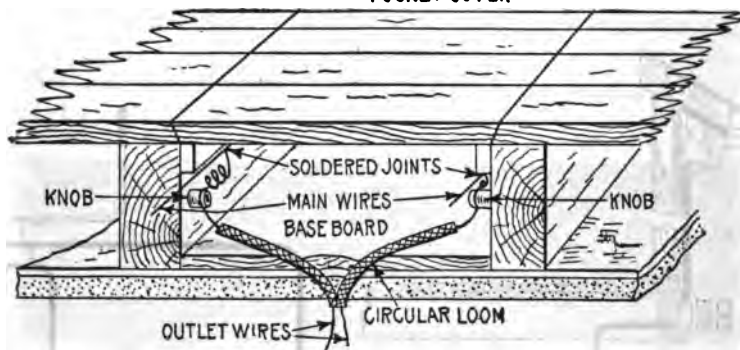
,244.—View of completed pocket and ceiling outlet showing method of bringing out the wires.
